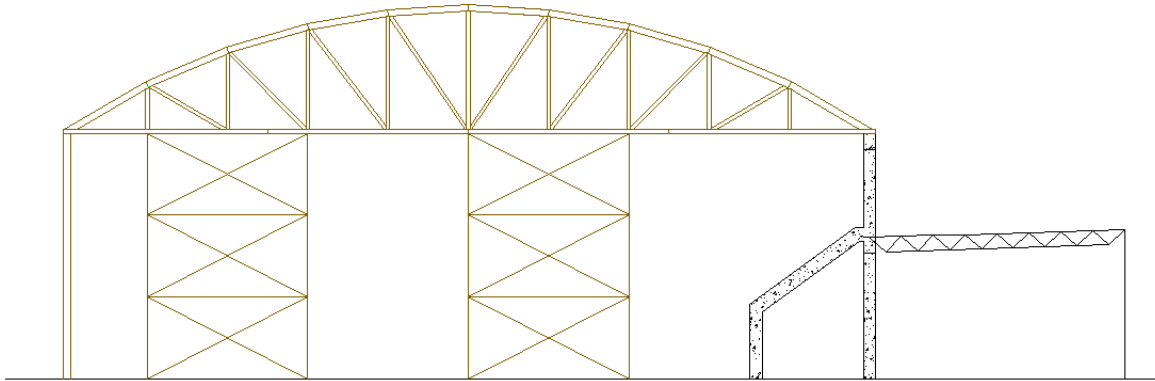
Elevation Showing Wood Braced Frames in East/West Direction
